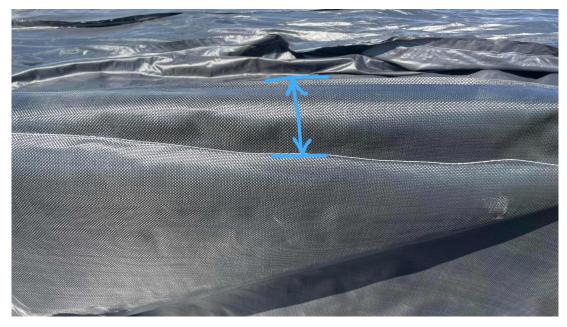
East Landfill No. 1 – Geotextile Fabric
